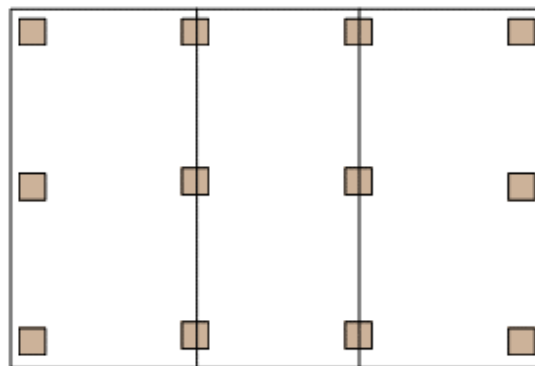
Point-supported CLT concept plan view (courtesy of Aspect Structural Engineers).
